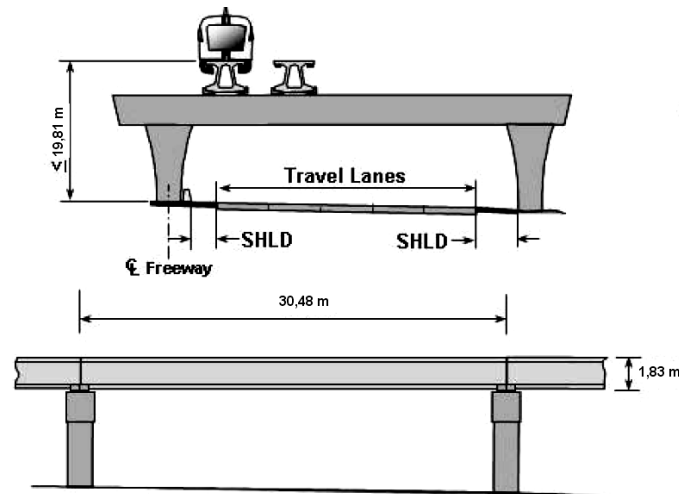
Elevated-guideway configuration: Type B - straddle bents [7]
